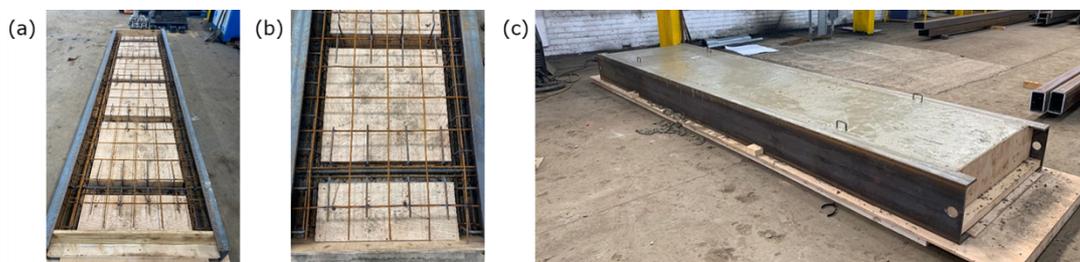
(a), (b) Prepared Specimen before Casting Concrete (c) Casted Specimen
